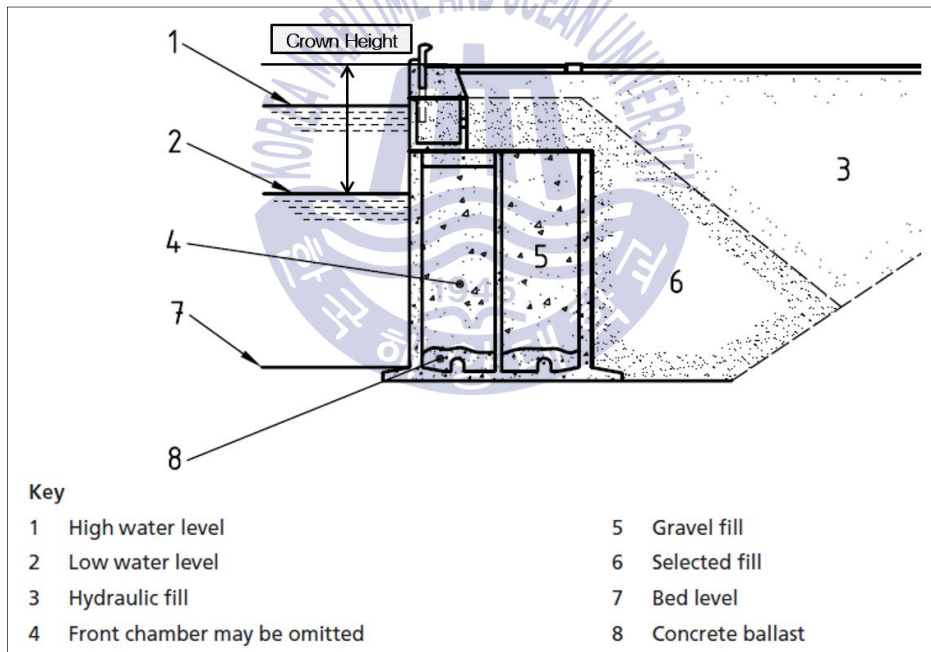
Key elements of concrete caisson deck structures(U.K)
